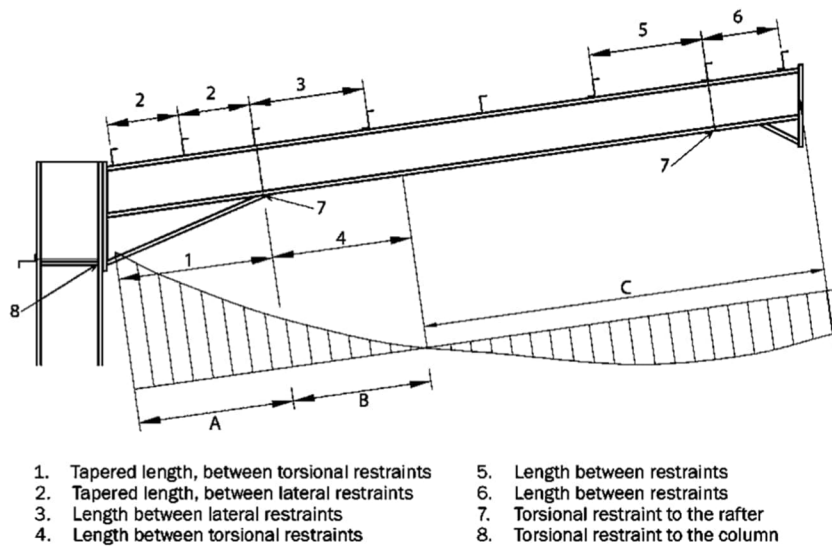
Typical restraints arrangements on a portal frame: gravity load [4]
